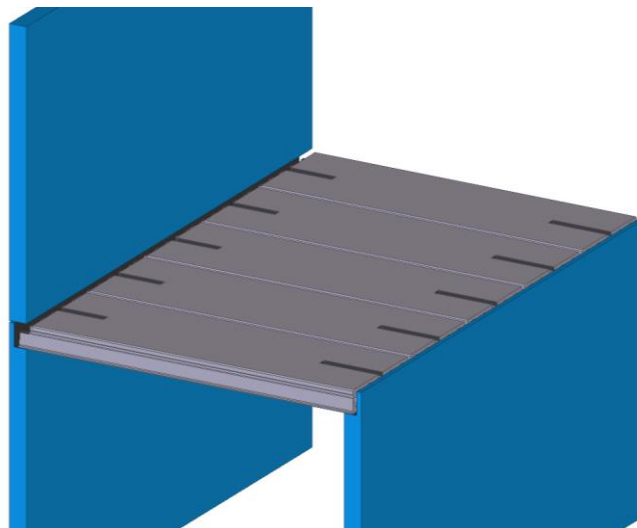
The hollow core units are commonly supported by placing the short edges on concrete walls. The walls and the hollow core units are tied together by reinforcement and grout. The recesses for the reinforcement in the hollow core units can also be seen.
